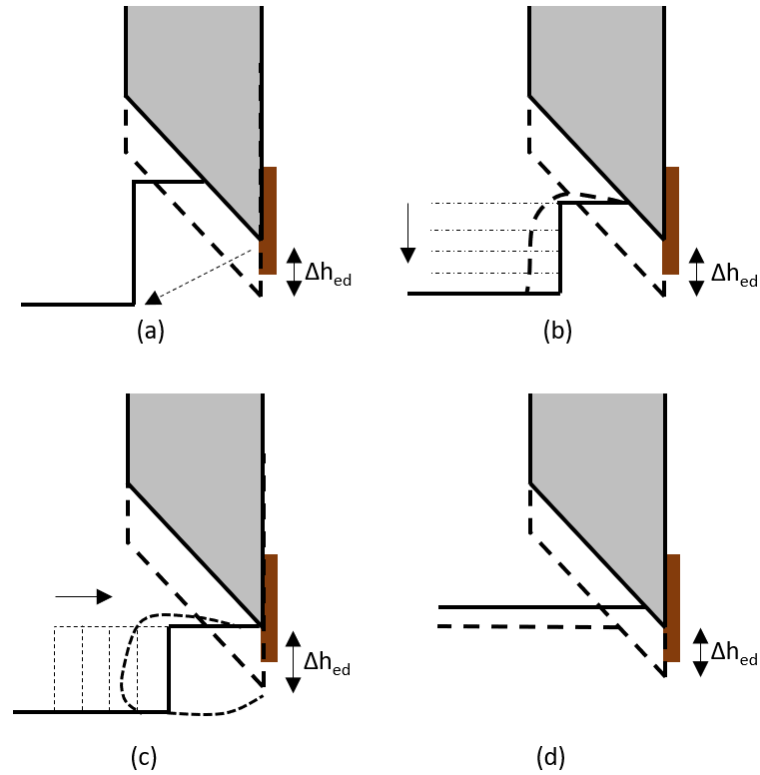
Methods of excavation beneath caisson; (a) with forces and simplified failure mechanism; (b) Deepening the trench to reduce supporting wedge; (c) Shortening wedge; (d) Uniform horizontal cuts (Nonveiller, 1987)
